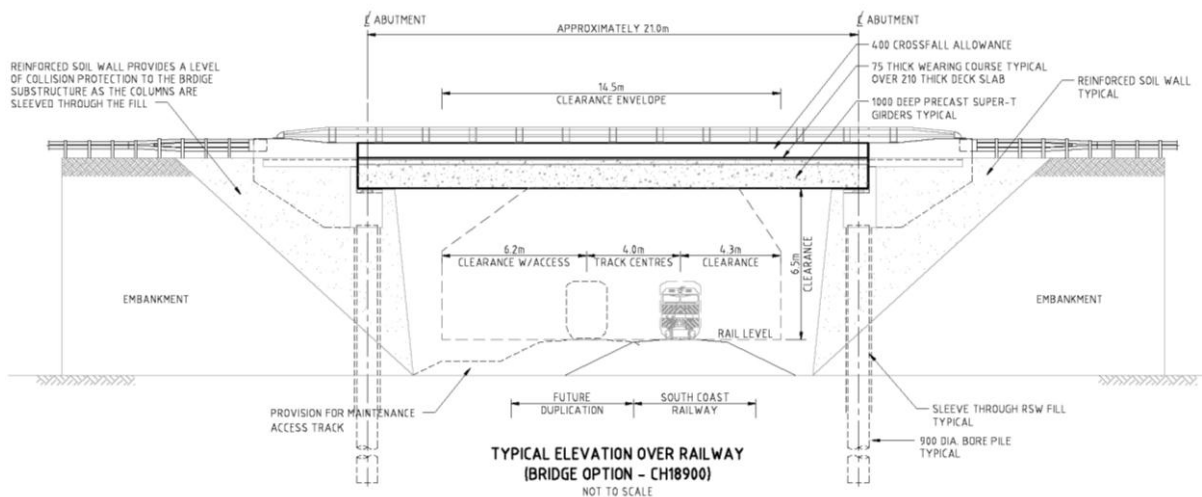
Annotated elevation of South Coast Railway underbridge
